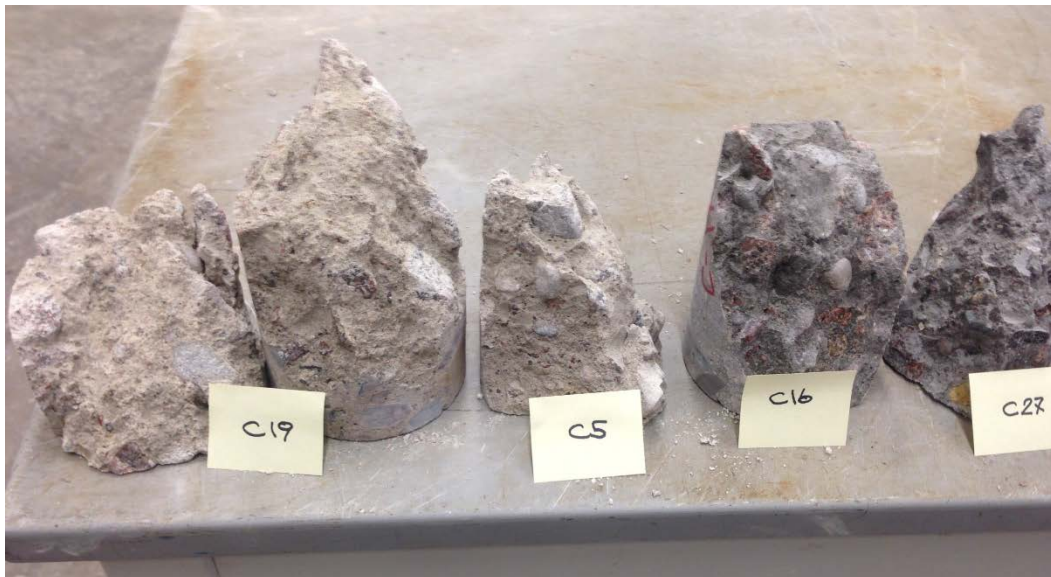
Cores C19 (West Wall, Room 505), C5 (South Wall, Room 538), C16 (West Wall, Stairs 2), and C27 (Floor slab, Room 111). Note: The different concrete colour between Cores C19/C5 and Cores C16/C27.
